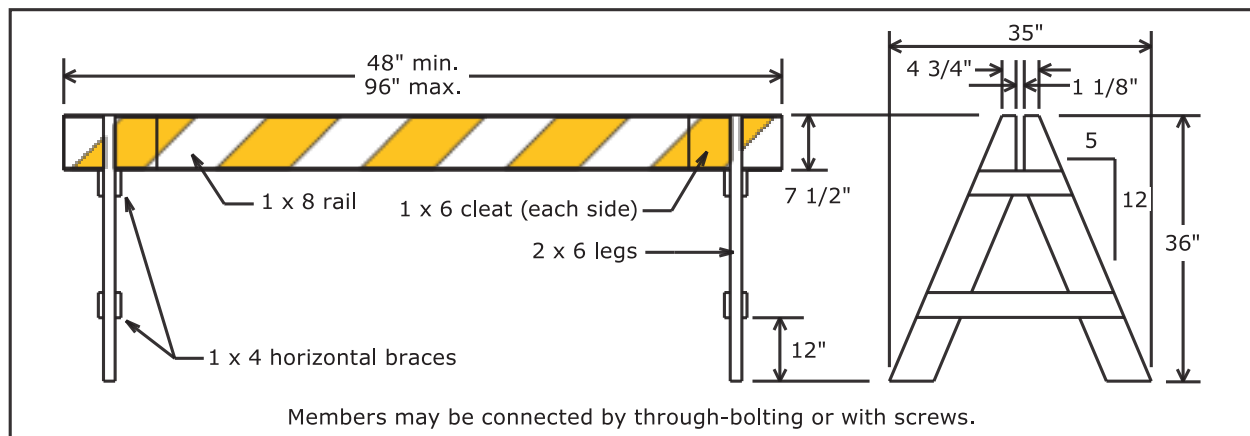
Generic HPPL A-Frame Type 1 Barricade
